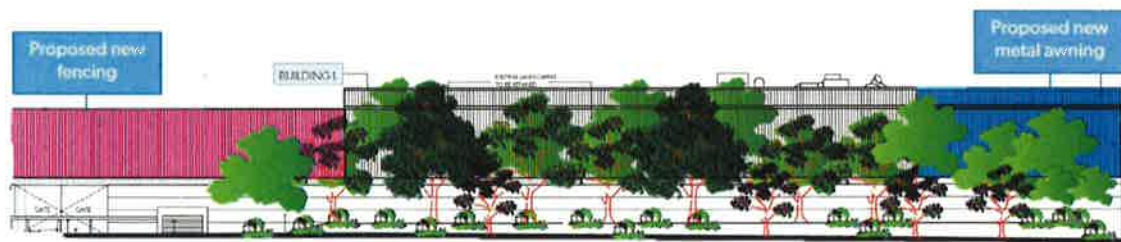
| Proposed New Awning (shown in blue) and Wall Extension (shown in pink)
